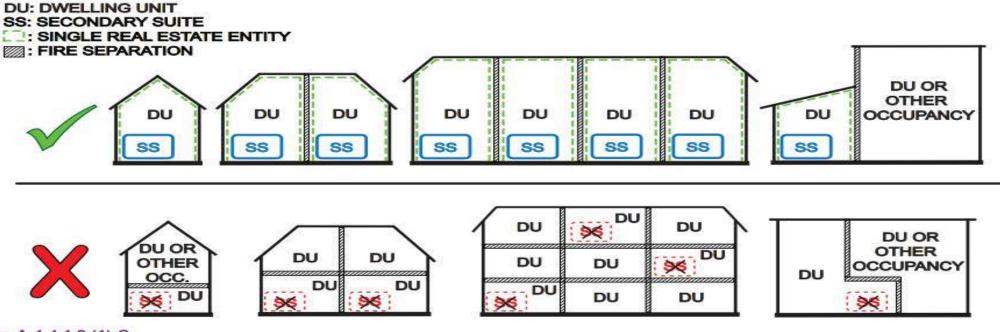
(1)-C Building Types where Secondary Suites are Permitted
